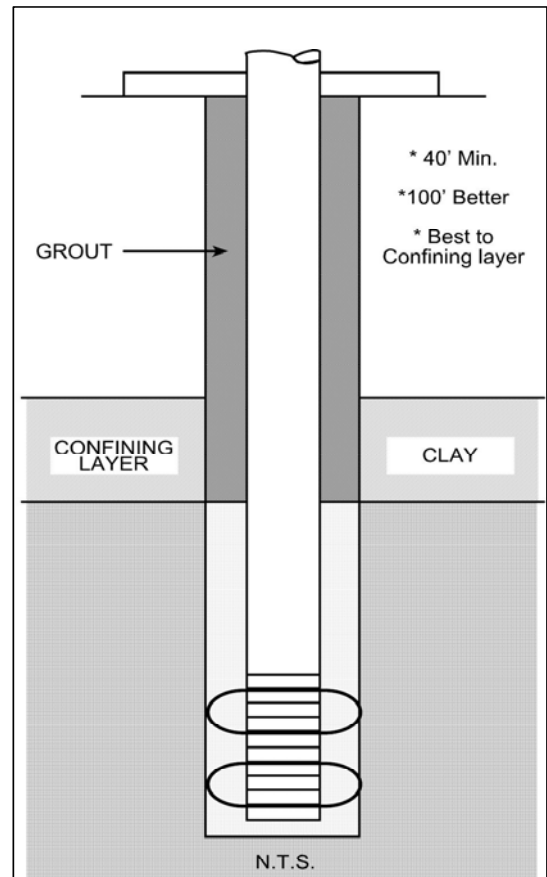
TYPICAL GROUT INSTALLATION FOR HCA WELL
